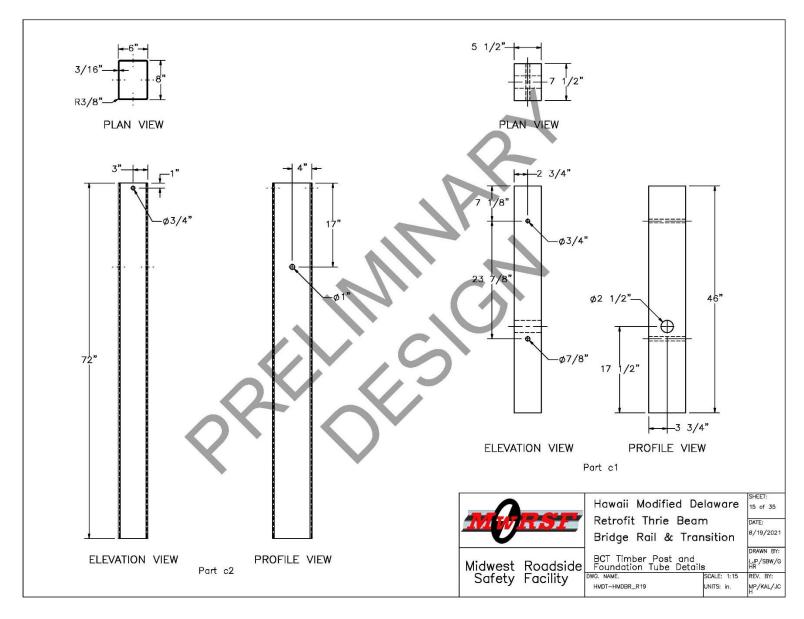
BCT Timber Post and Foundation Tube Details, Test No. HMDT-1
